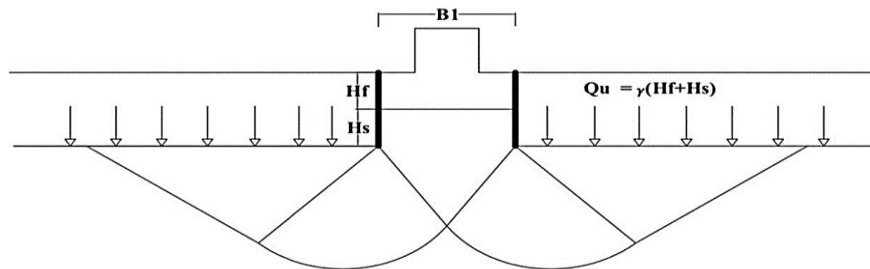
Failure of bearing capacity of soil beneath a strip footing with vertically loaded structural skirts (AL-Aghbari and Mohamedzein, 2004)
